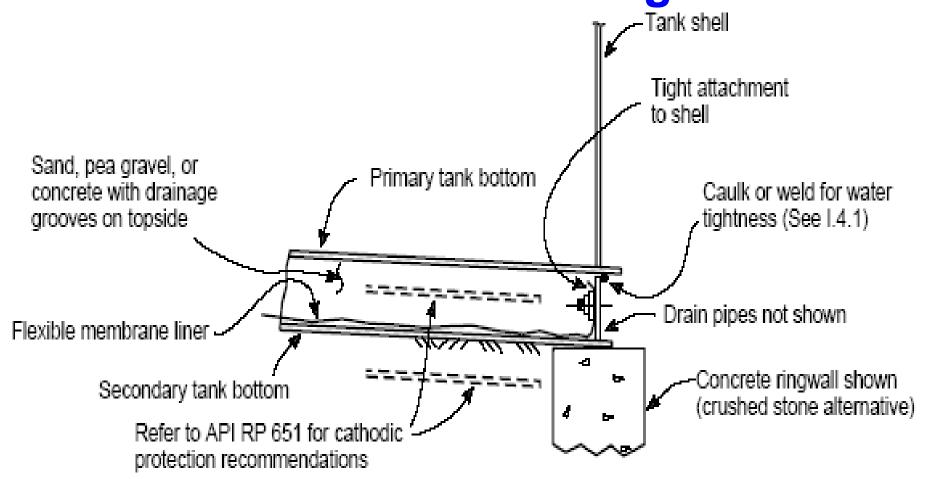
Double Steel Bottom with Leak Detection at the Tank Perimeter (Typical Arrangement)
